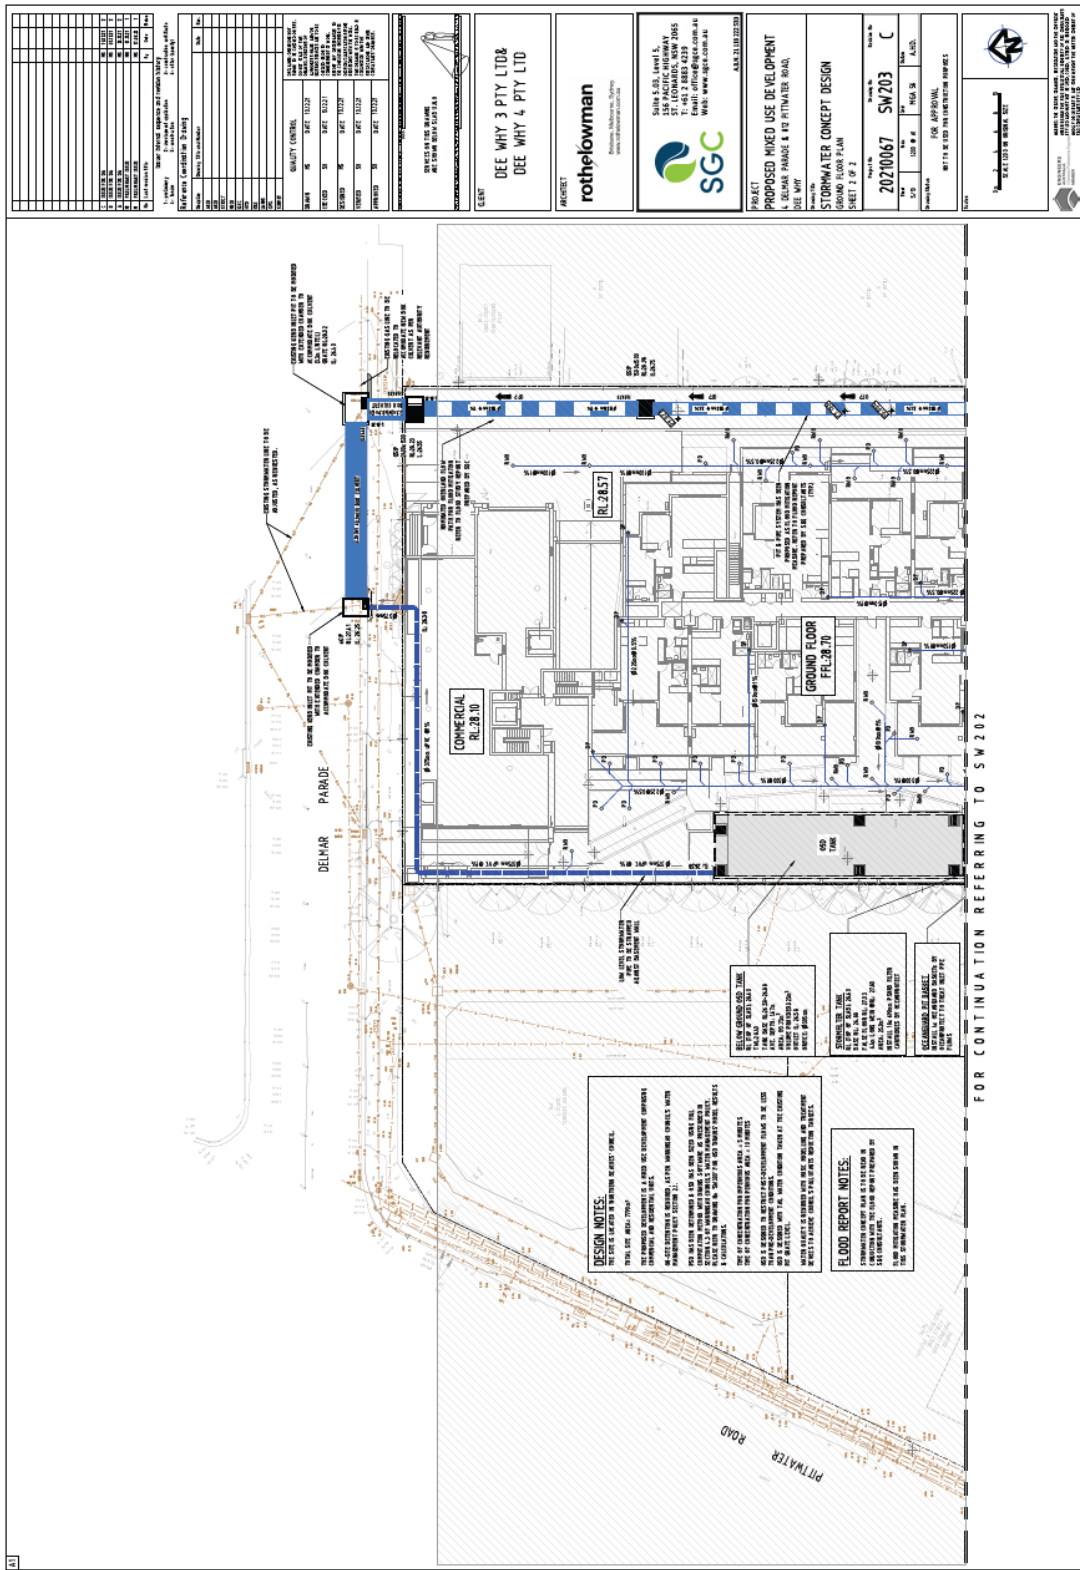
Ground Floor Stormwater Concept Plan Part 2 by SGC
